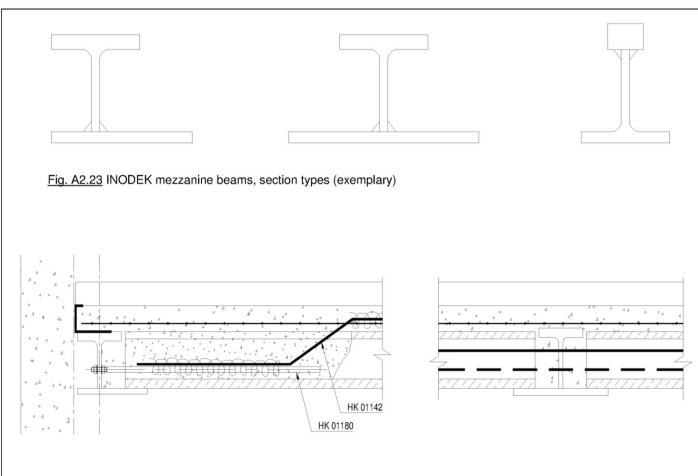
INODEK beam detail connection to reinforced concrete ceiling
